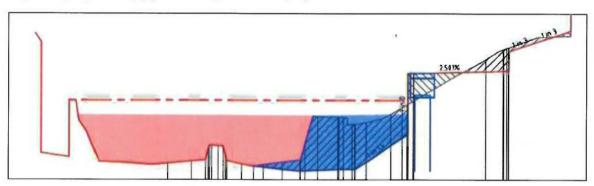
Sheas Creek Open Channel Cross Section Downstream of Huntley Street (taken at CH 60)
